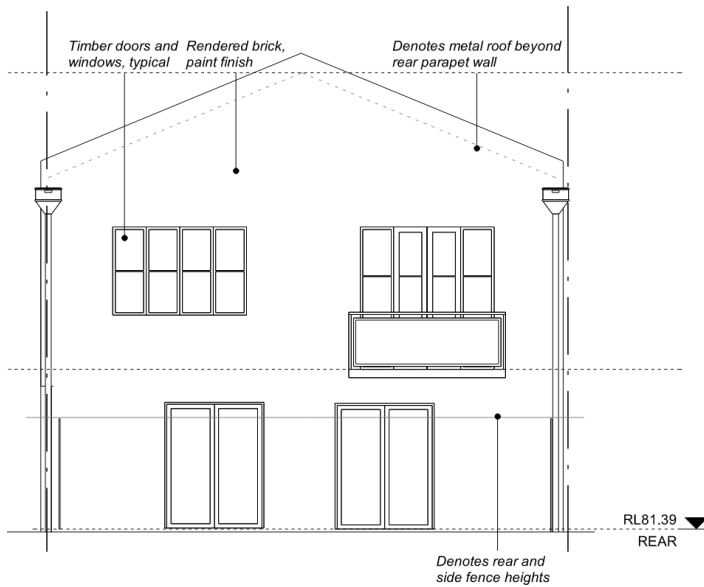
Proposed North (Rear) Elevation (Source: HallGroup & Co)
